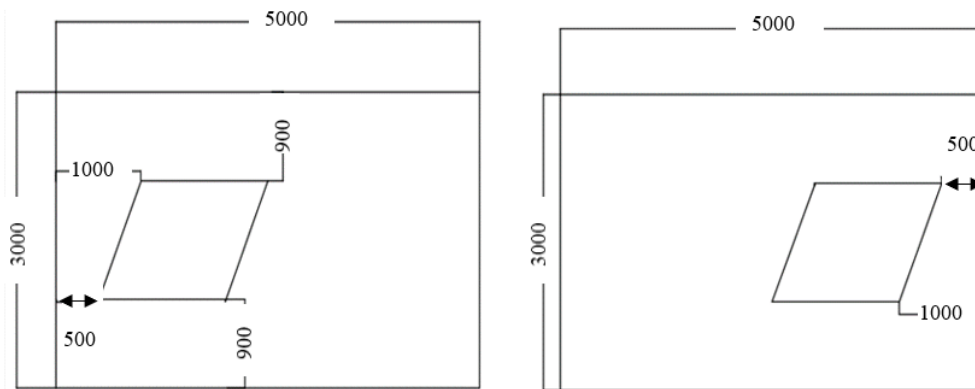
Configuration of openings in shear wall in tall building, all unit in millimeters (mm)
